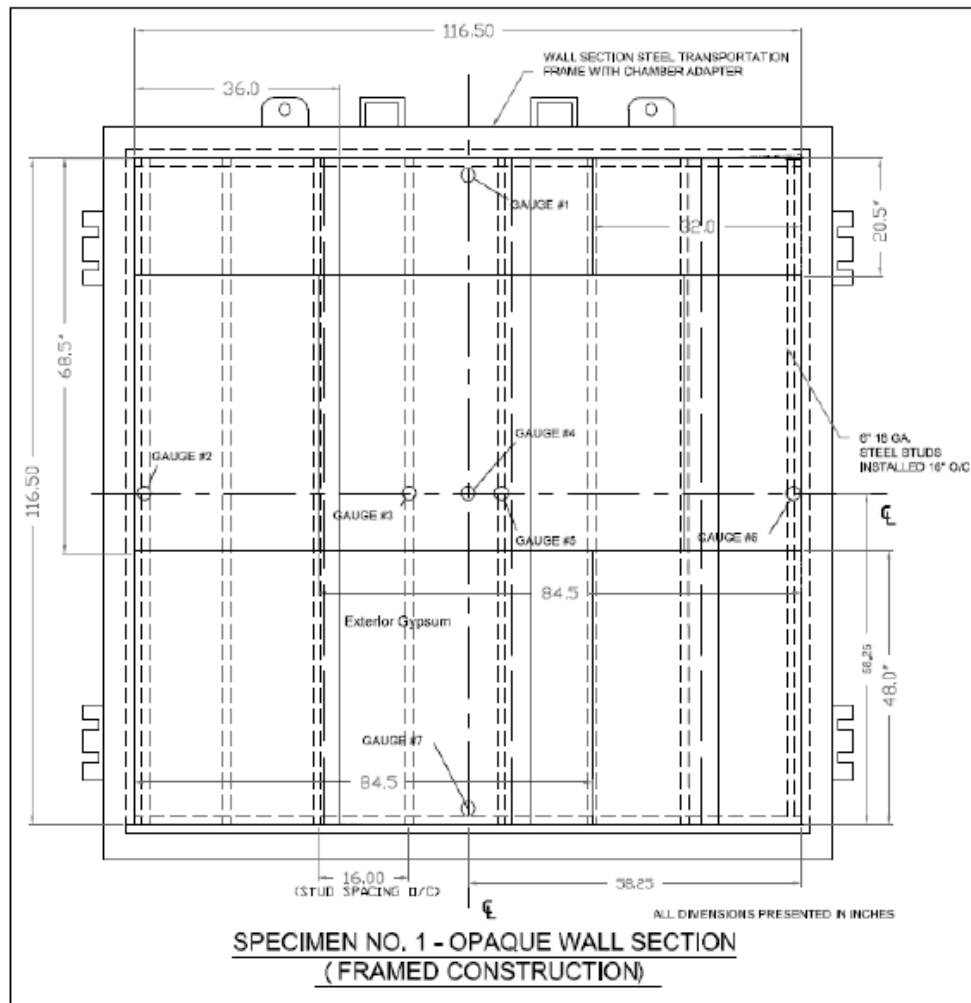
Element Specimen 20-06-B0040-SS-OP-1 Gauge Locations
